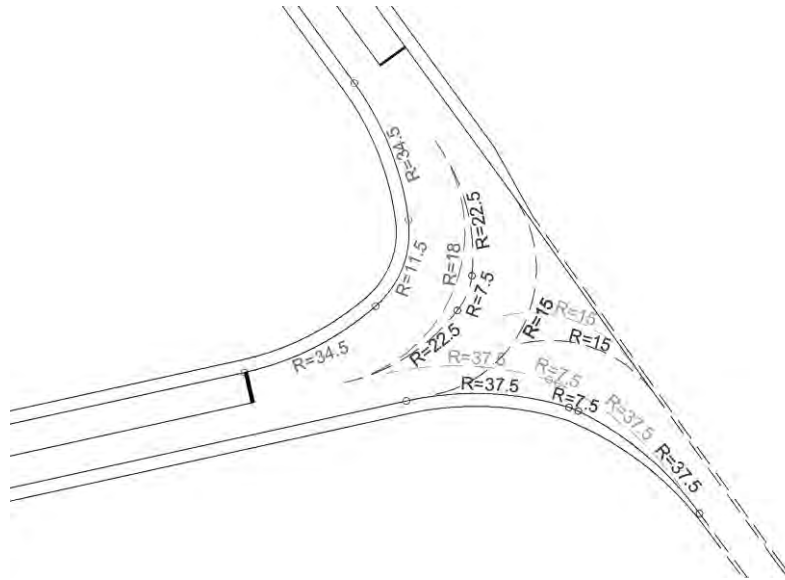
Turning Path at No.2 Intersection (Alternative-1)
